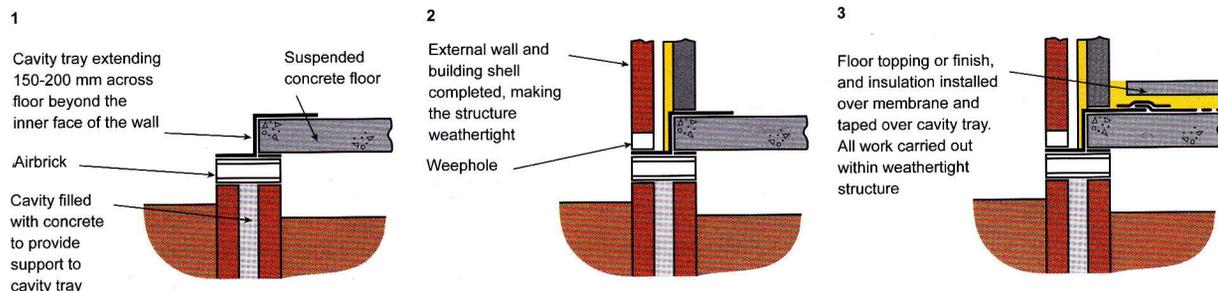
Construction steps to minimise damage to the barrier and enable sealing of barrier joints to be carried out in dry conditions
